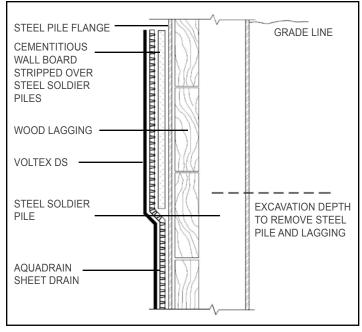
CEMENTITIOUS BOARD AT GRADE Install cementitious board strip over steel piling at grade to protect waterproofing during removal of top lagging boards and top of steel pile.
